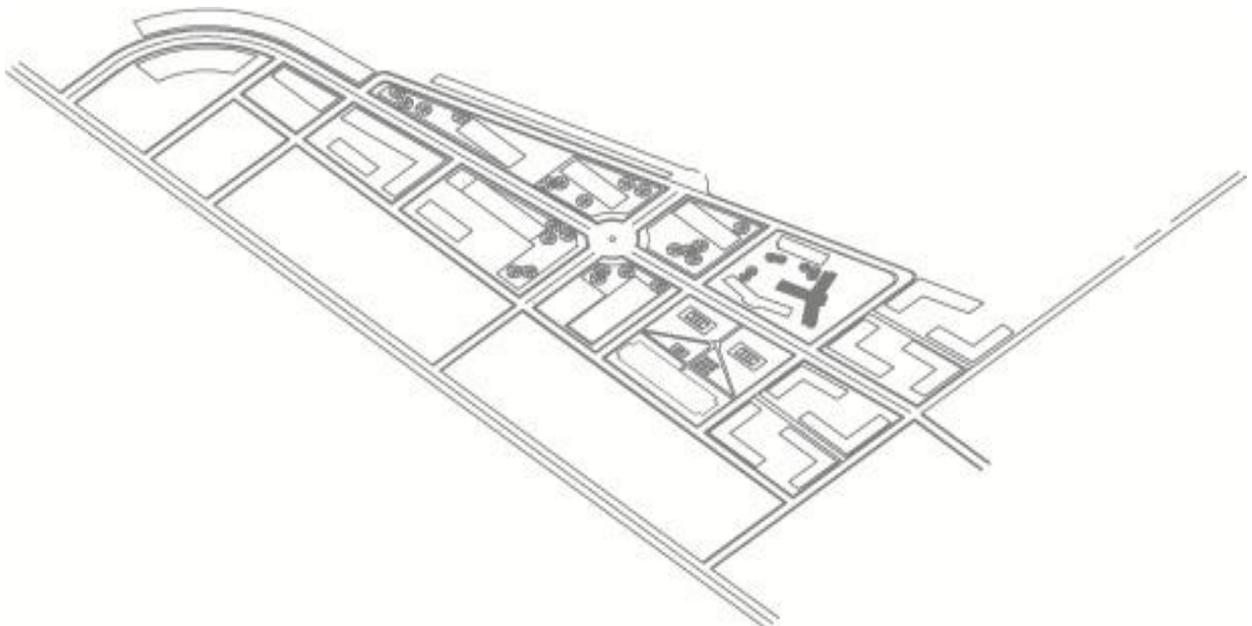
, shows the master plan of the site. 3D images of the master plan can be seen in the following images.
